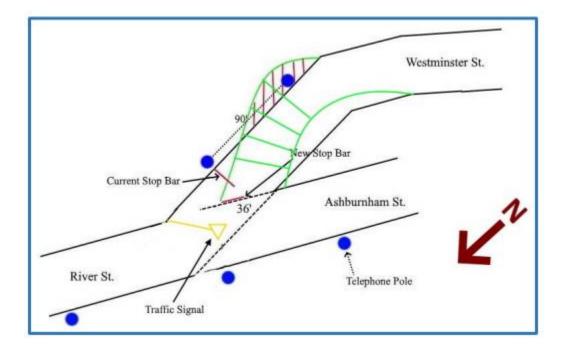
Route 31 at Route 12 Recommendation, Fitchburg
